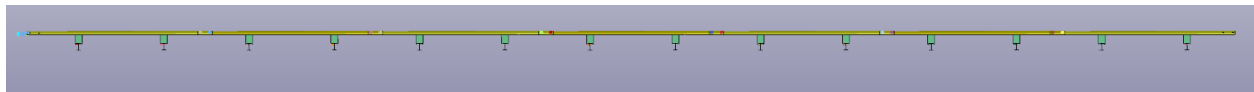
Overhead View of 87.5 ft Guardrail System with 37.5 inches Downstream Impact Point
